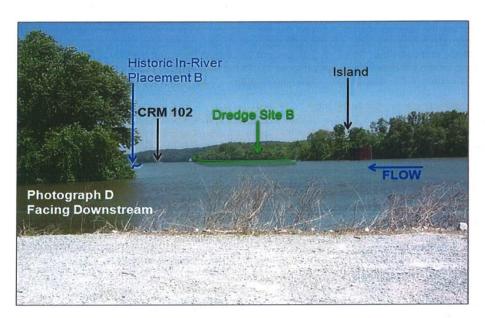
Cumberland River - Island, Dredge Site B, and Placement Site B Locations.
